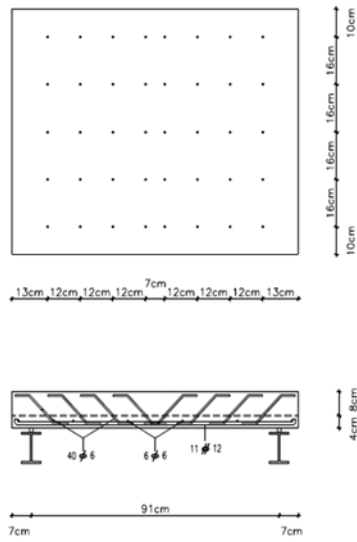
Typical dimensions and reinforcement of composite pre-slab (S12)
